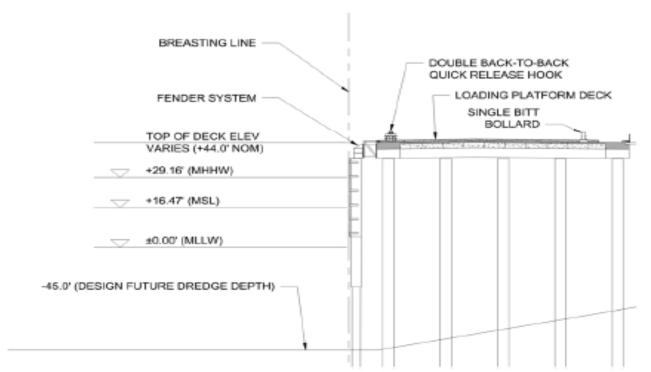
PCT Berth Typical Cross Section at Loading Platform
